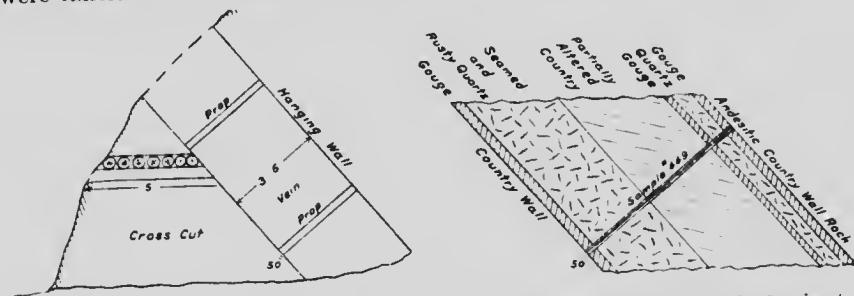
Sketch showing section of entry and vein on Humper No. 1.
